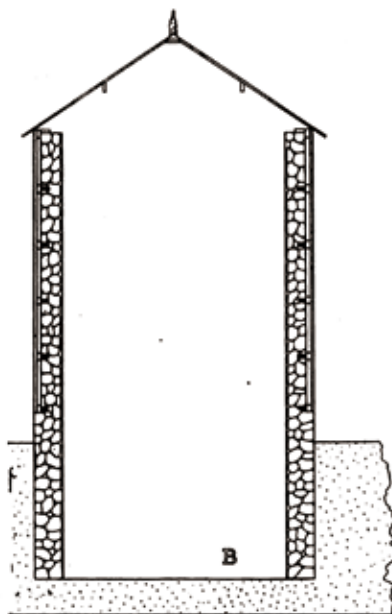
Shows the method of jacketing a stone silo to protect it against frost; the heavy black squares are blocks bedded into the stone wall to which girts or studs may be nailed to carry the siding.
